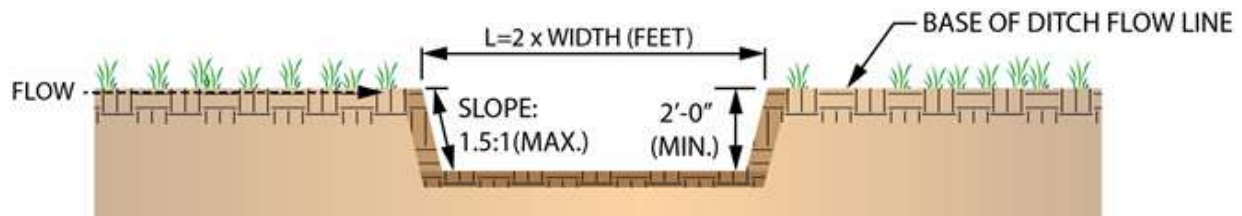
ALDOT Rock Ditch Check with Sump Excavation (Alabama Soil and Water Conservation Committee 2022)
